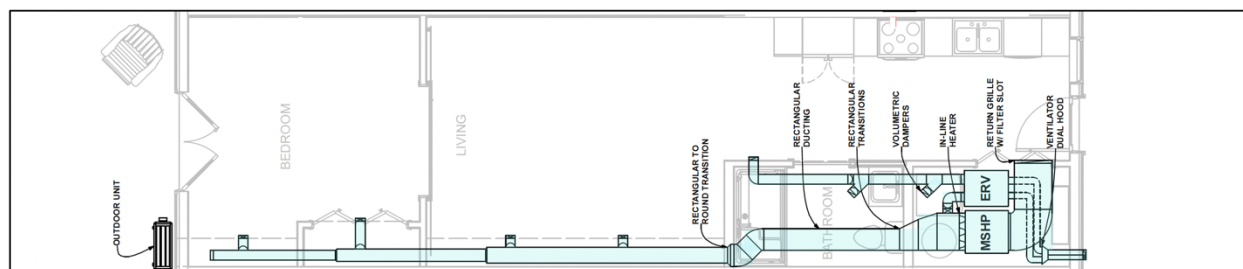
Floor plan layout demonstrating the ducting strategy as developed in collaboration with VEIC.⁴ Source: NREL.
